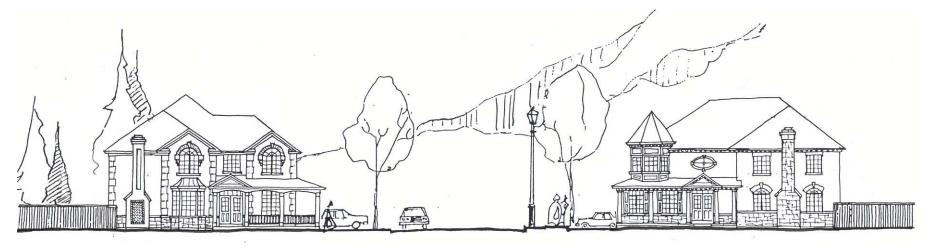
Conceptual Streetscape Image of Corner Lot Dwellings
